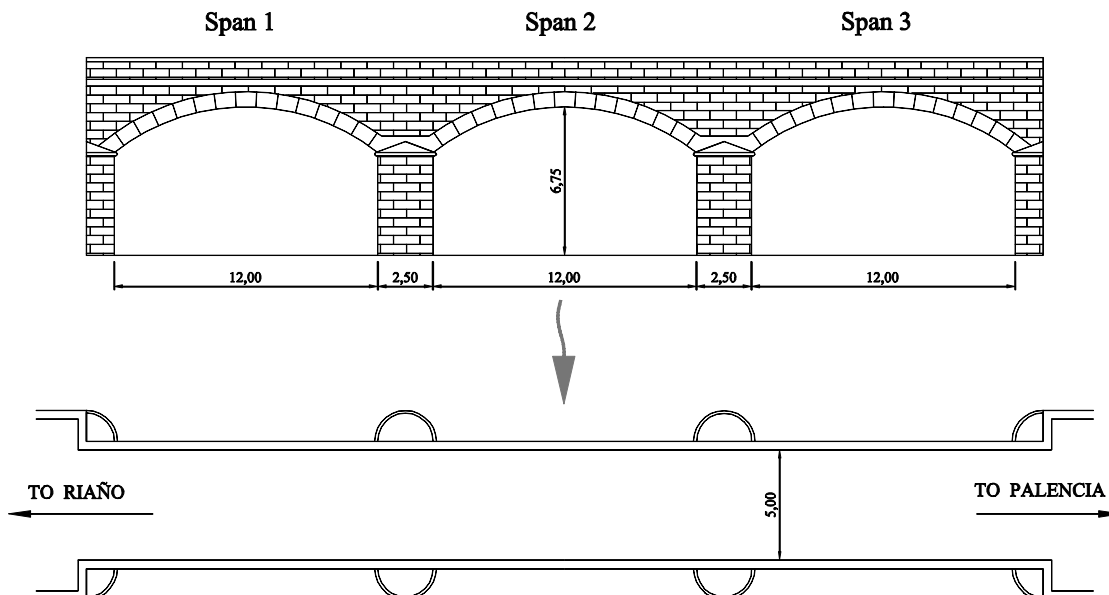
Ground plan and elevation of Velilla del río Carrion Bridge (Spain).
